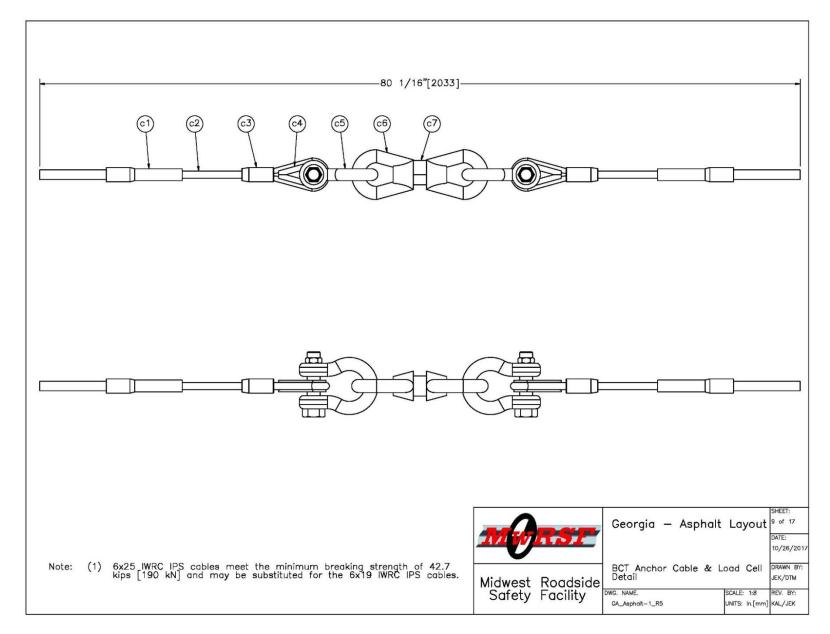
BCT Anchor Cable and Load Cell Detail, Test No. GAA-1
